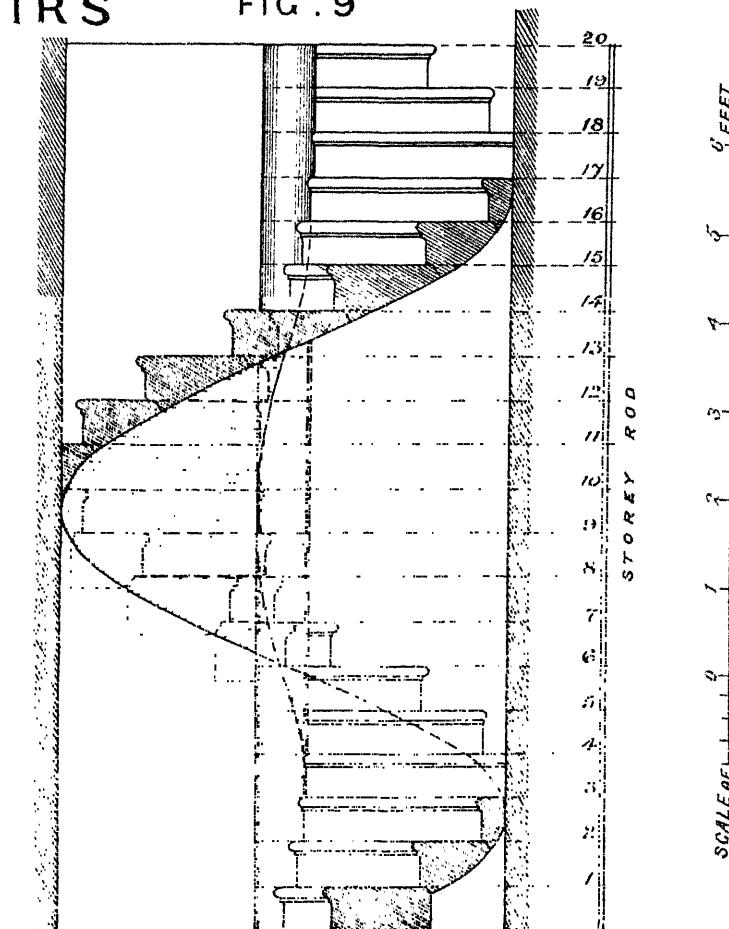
Is a sectional elevation of the winding staircase shown in Fig. 8.
